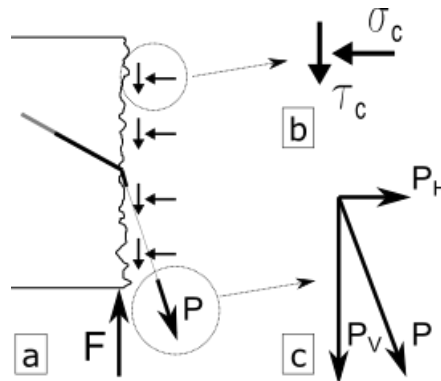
Forces through the cracked section: a) general scheme; b) concrete-to-concrete friction; and c) fibre load.
